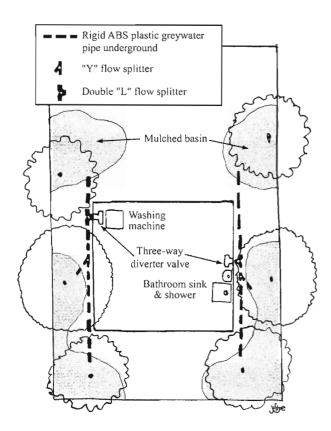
A. A branched-drain greywater system for a low-water-use household. Flow splitters and underground pipes direct greywater to six outlets within mulched basins (plan view). Note greywater pipe under raised paths for easy access and more drop potential
